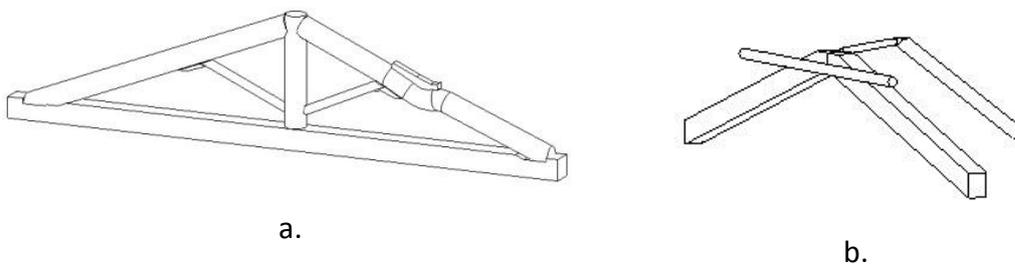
Examples of the assemblies - (a) Roof truss 1 and (b) Roof truss 3.
